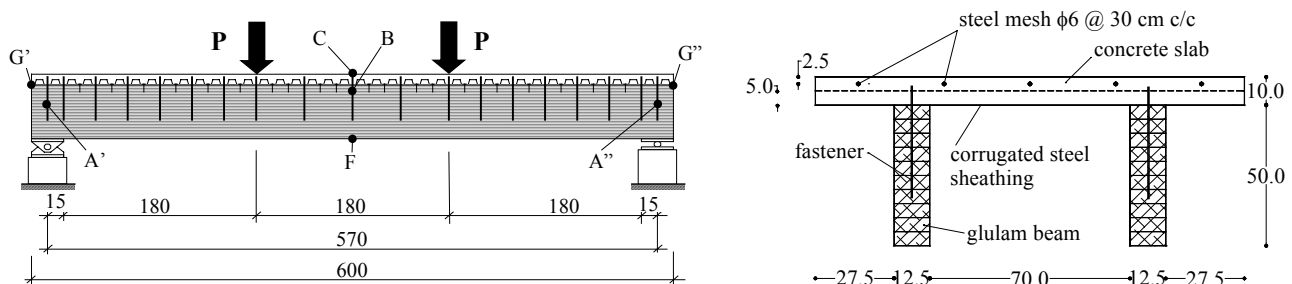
Longitudinal view and cross-section of the composite beam (measures in cm)
